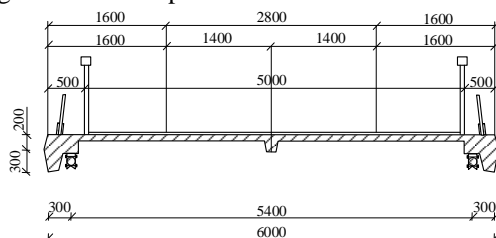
Cross section of the bridge (all dimensions are in millimetres)
